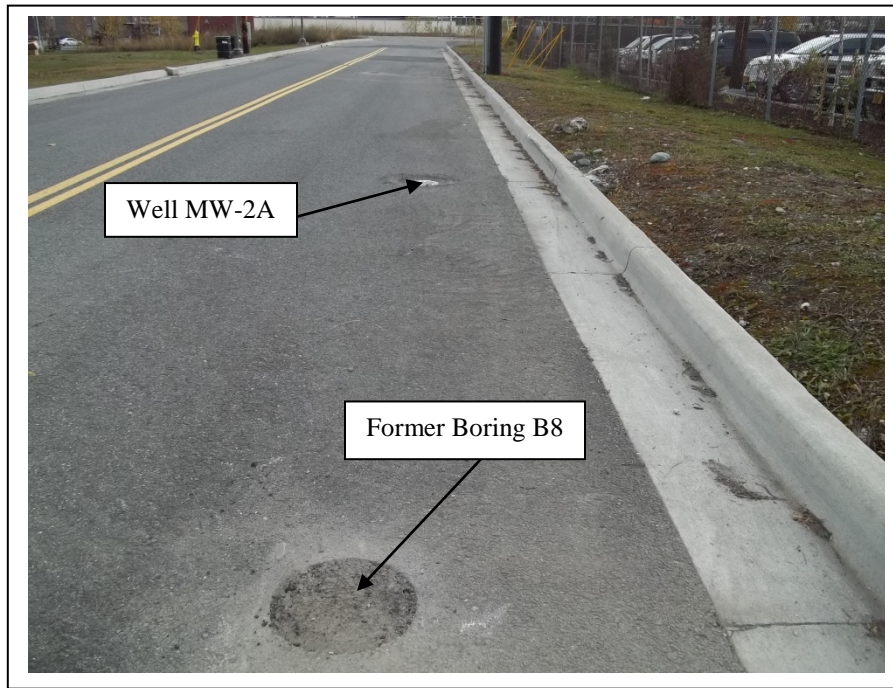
Asphalt cold-patches were used to restore the ground surface at Borings B7 and B8 which were advanced in a road; looking southeast. (October 9, 2014)
